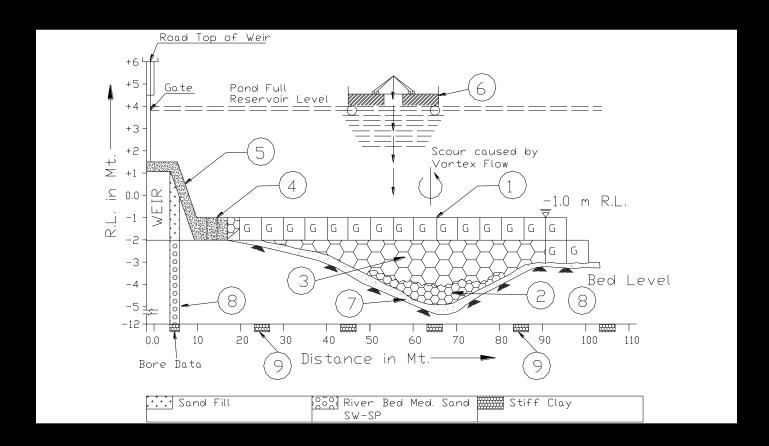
Typical Cross-Section of Upstream Scour Hole Indicating,(A) Upstream concrete Top & Apron, (2) Proposed repairs
